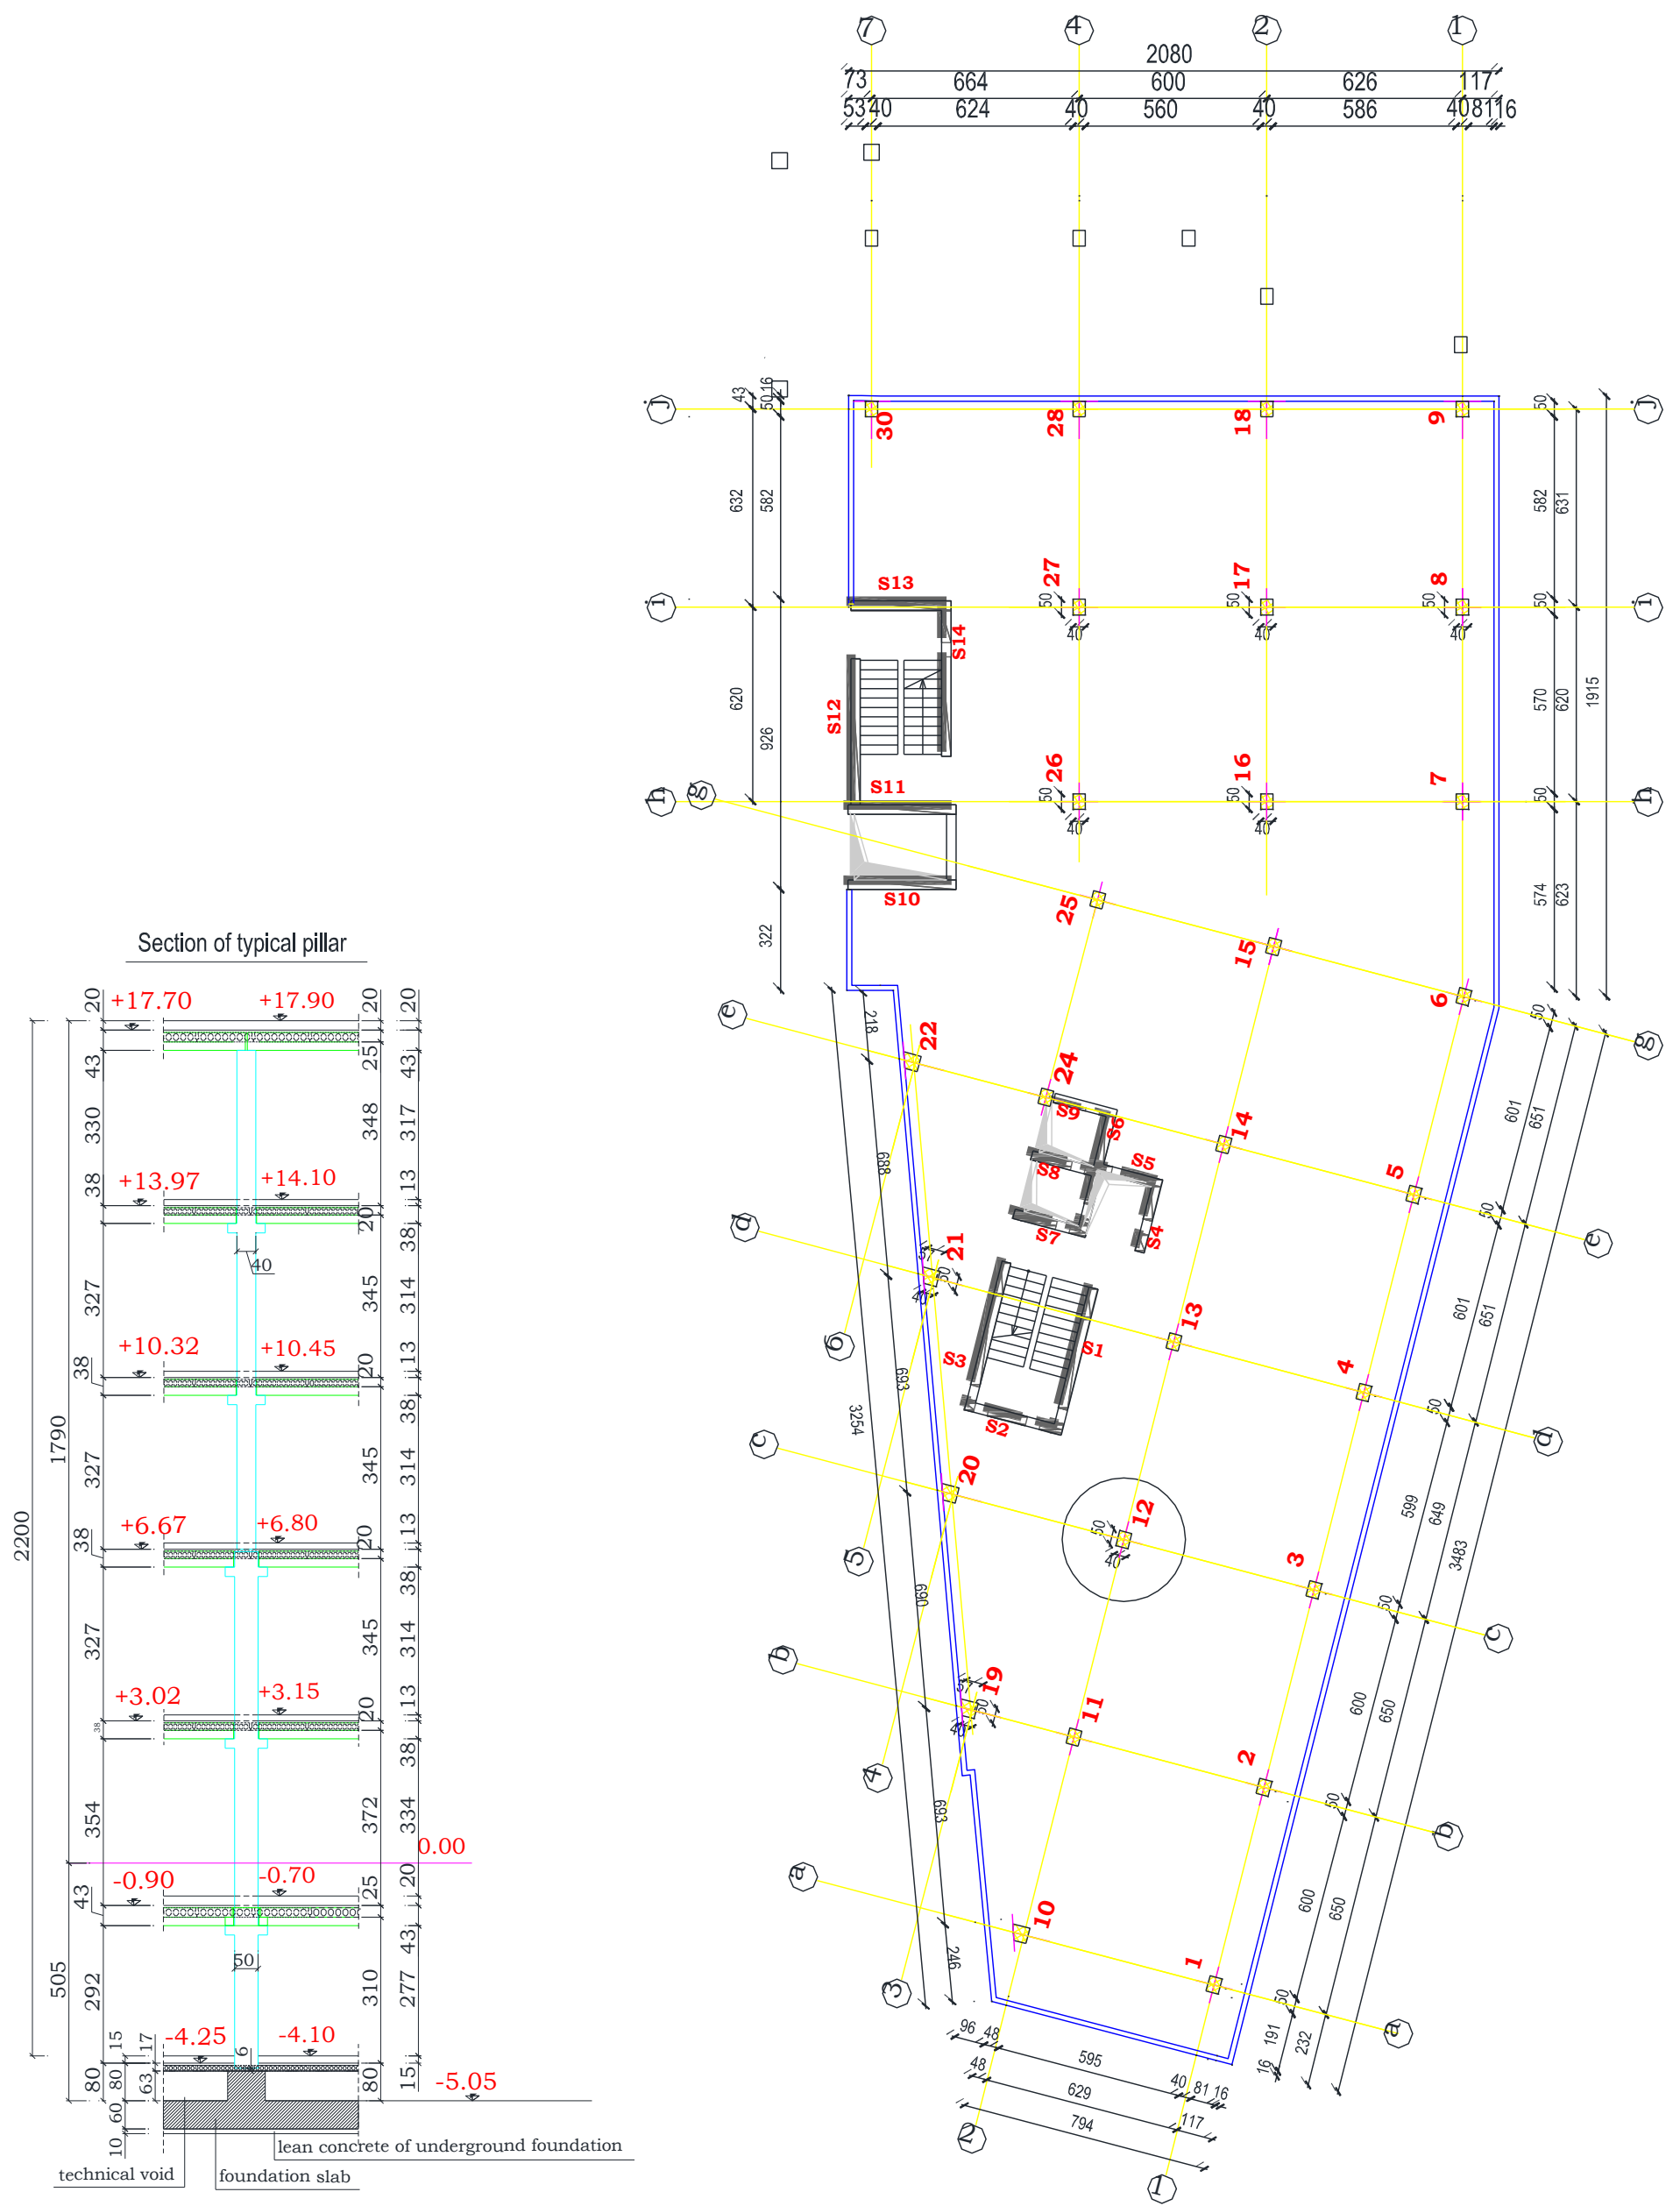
The vertical section of a pillar 50x40cm and its position in plan
